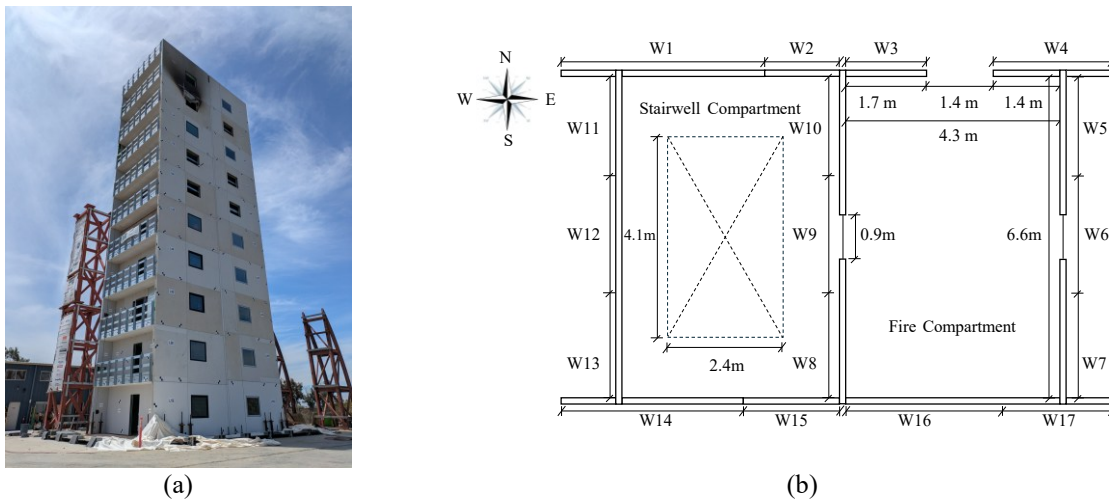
(a) Picture of the 10-story CFS building on the UC San Diego shake table after the fire test at L9. (b) Floor plan of the building with interior dimensions of the fire compartment.
